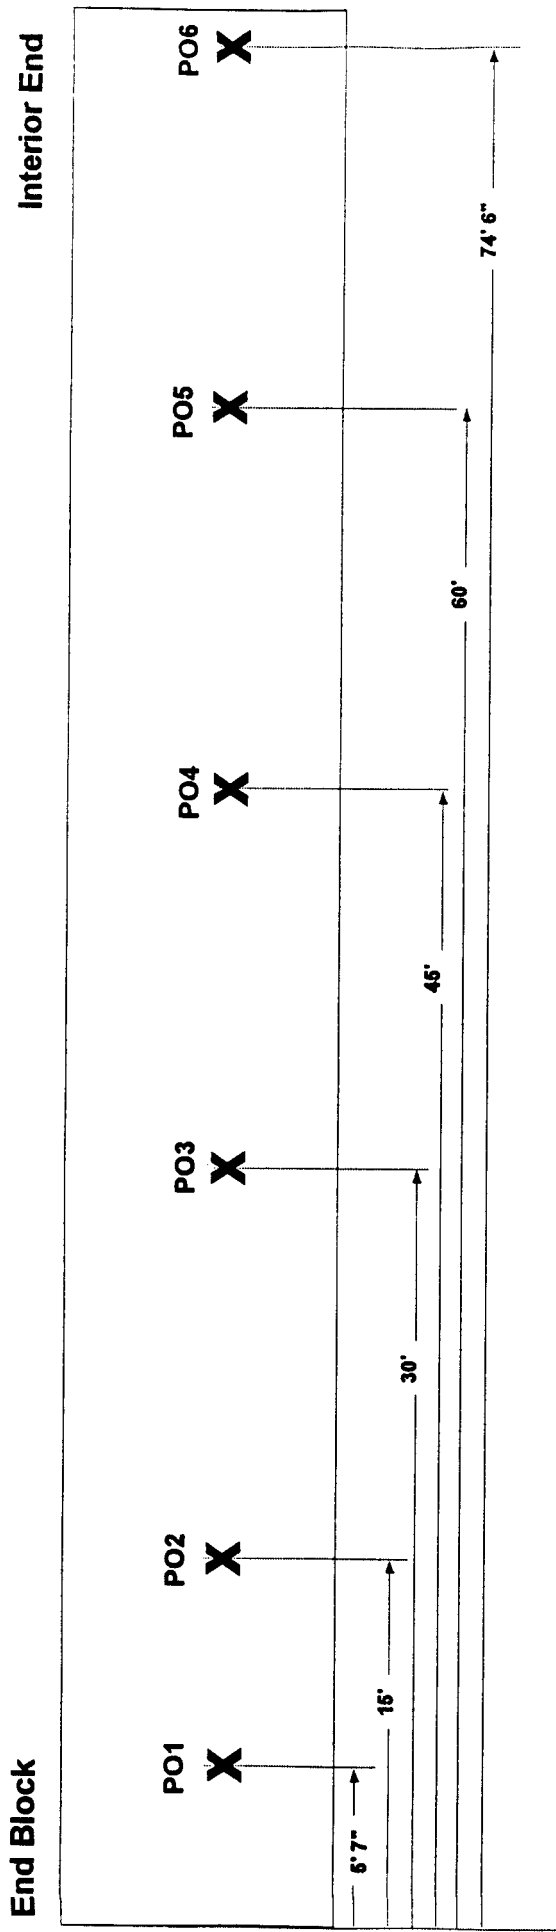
Location of Duct Strain Gages in Field Girder with Oval Ducts
